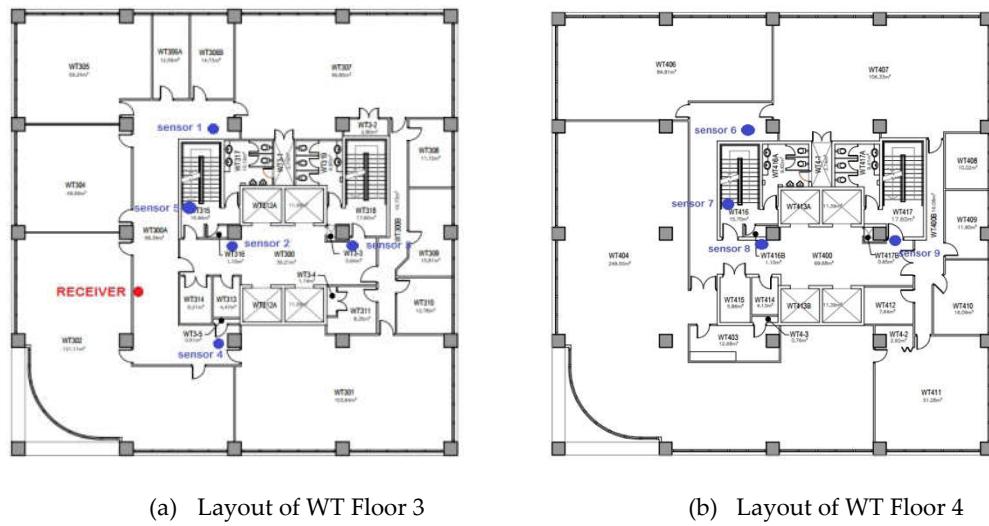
Deployment of sensor nodes on Floors 3 and 4 of WT Tower building.
